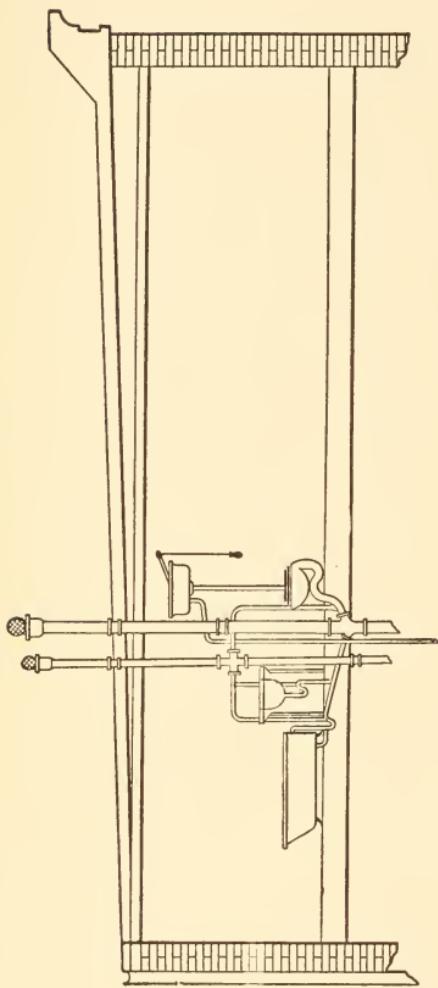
SYSTEM OF HOUSE DRAINAGE, SHOWING THE PLUMBING OF A HOUSE. (H. BRAMLEY.)
